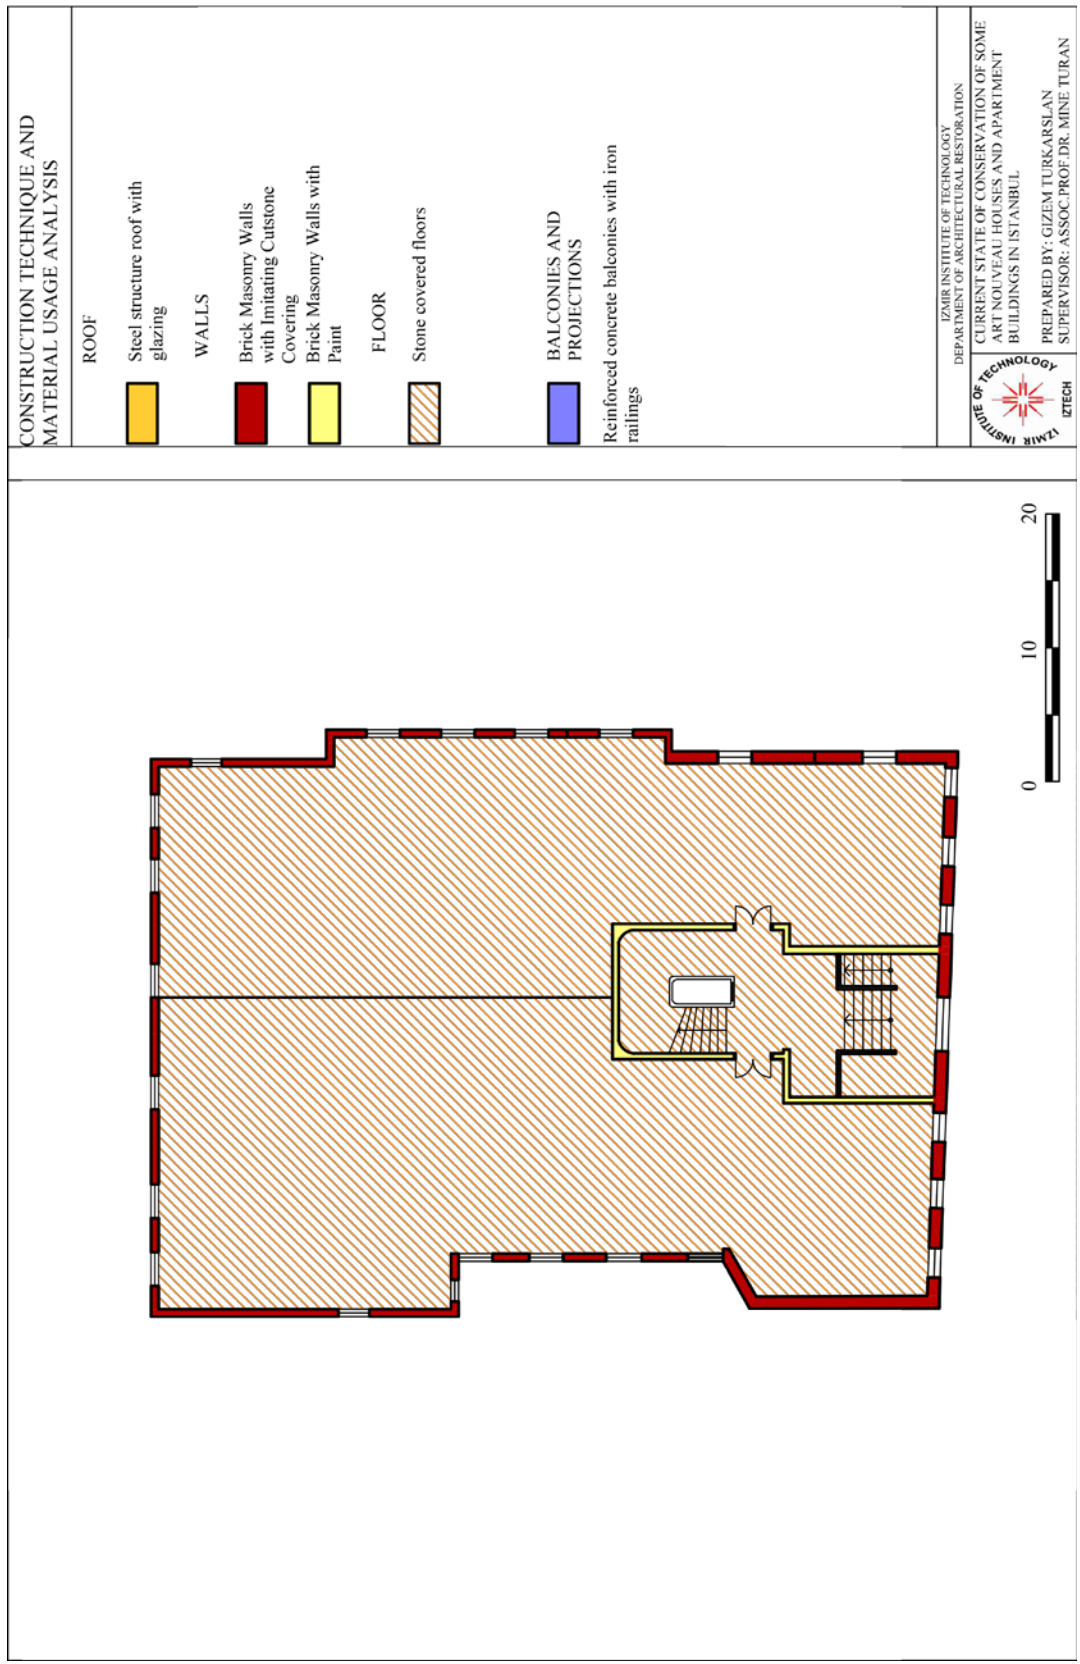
Ground Floor Plan, Construction Technique and Material Usage Analysis of Güneşsu Palas
